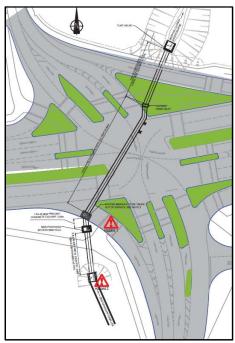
Existing culvert shown against existing and proposed road layouts
